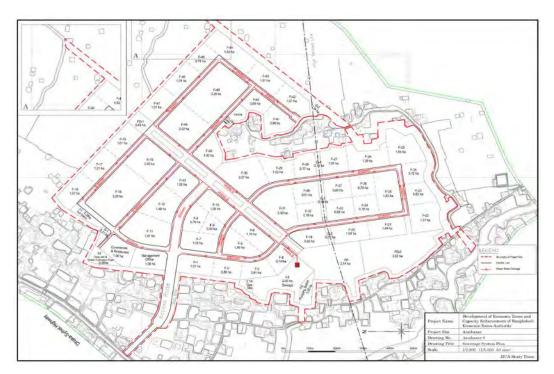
(4)-11 Araihazar waste water treatment plan
